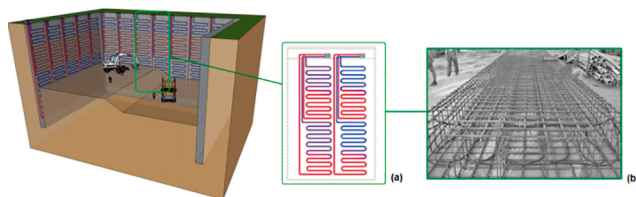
Retaining structure used in energy facilities: a) pipe-positioning scheme in a structure; b) geothermal pipes attached to a reinforcement [14]
